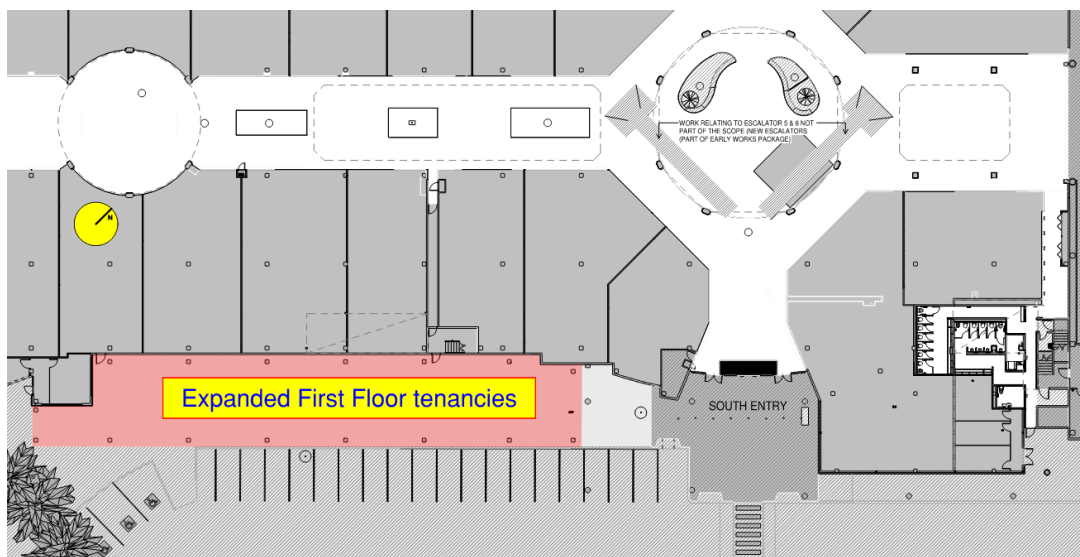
Omission of sprinkler protection below new extended tenancies on First Floor
